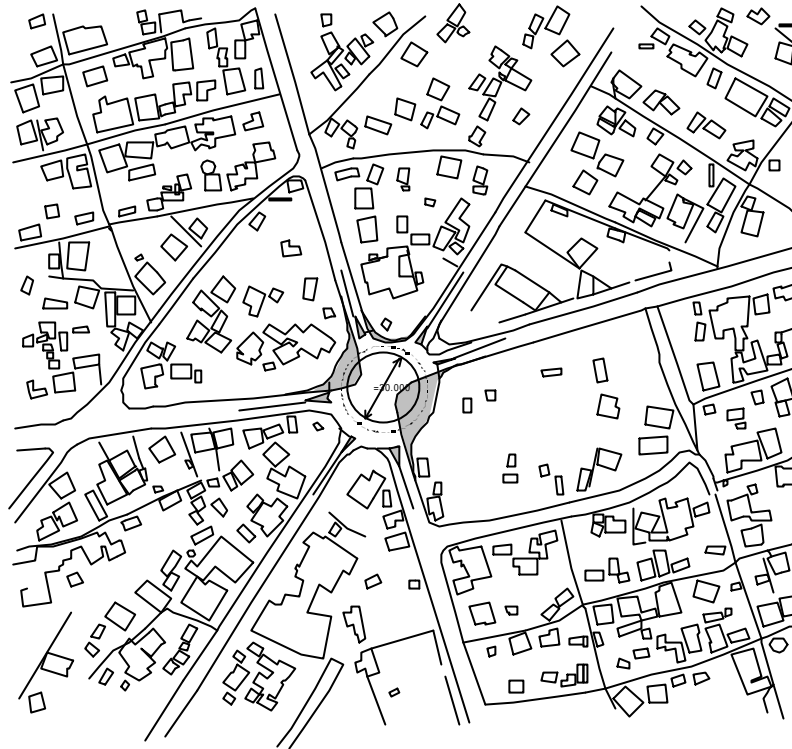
Draft Plan of Roundabout on Av. Vladimir Lenine
